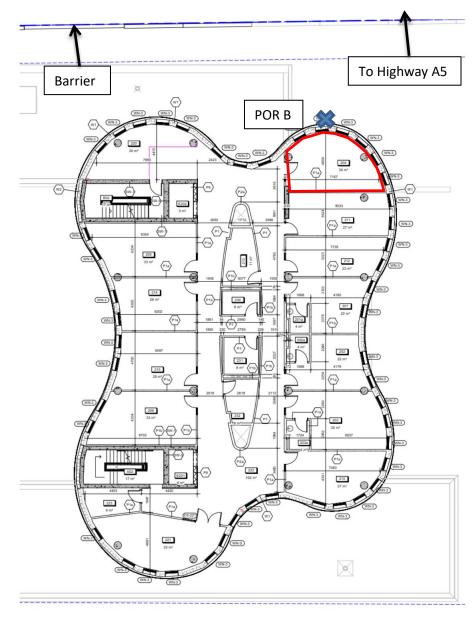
Floor plan section of 2nd floor showing the plane of window (POW) point of reception, POR B location
